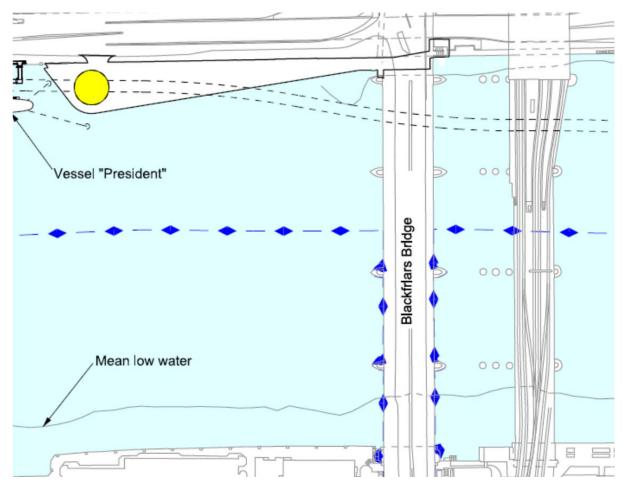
Plan of River bed Blackfriars Road and Rail Bridge
